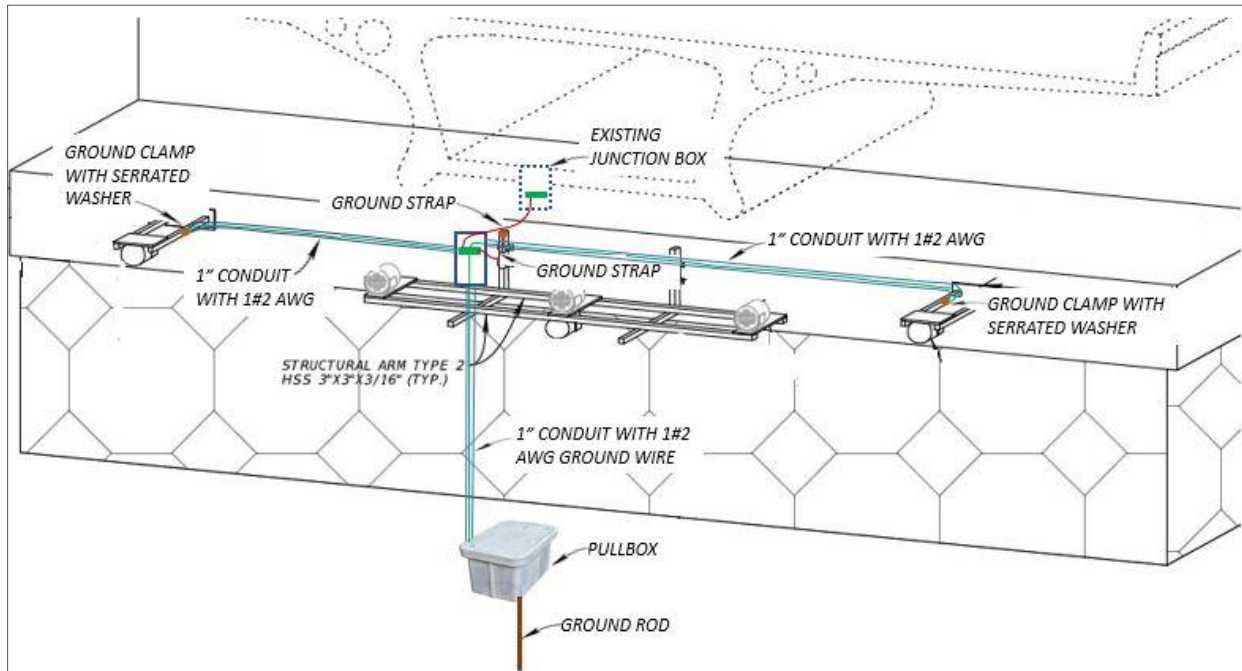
STRADDLE BENT GROUND WIRE ROUTING PLAN VIEW
